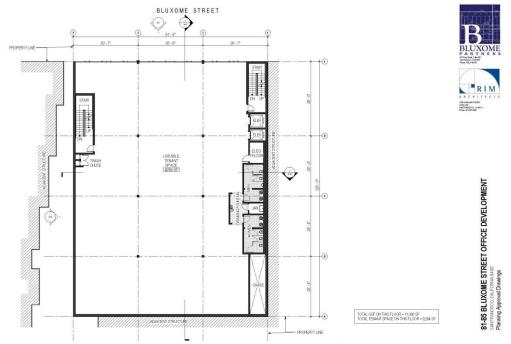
Proposed Floor Plan – Levels 2, 3, and 4
